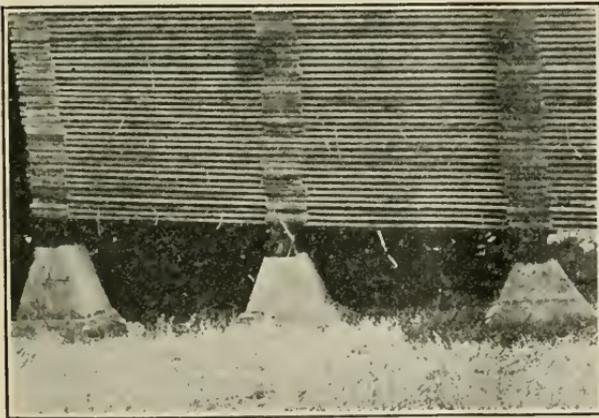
Concrete foundations with untreated skid timbers in general use in a mill yard at Laurel, Miss. Only two rows of piers are used for stock 14 feet or less in length.
